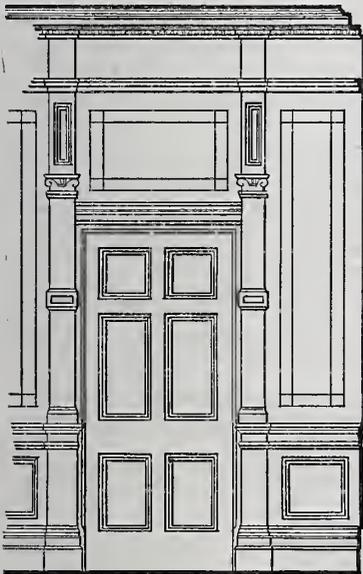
Elevation of Door.—Scale, 1/4 Inch to the Foot.
